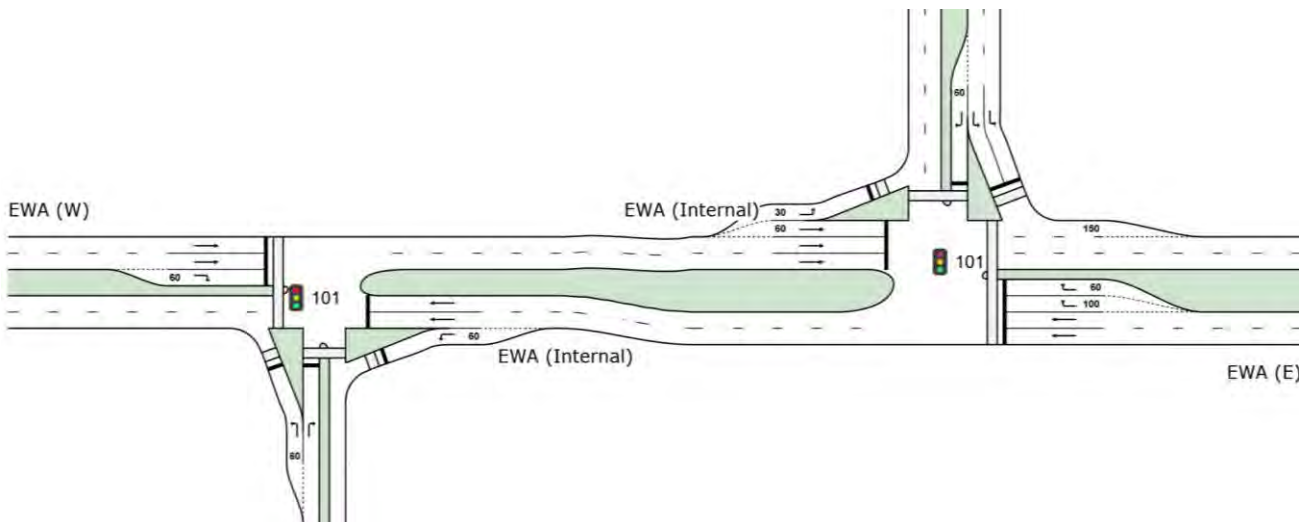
Staggered T intersection layout (SIDRA Network schematic)
